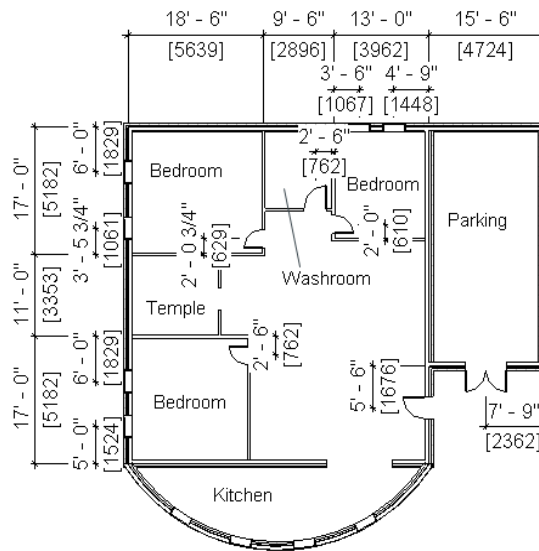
Sketch plan of walls with created doors and windows and added floor and ceiling
